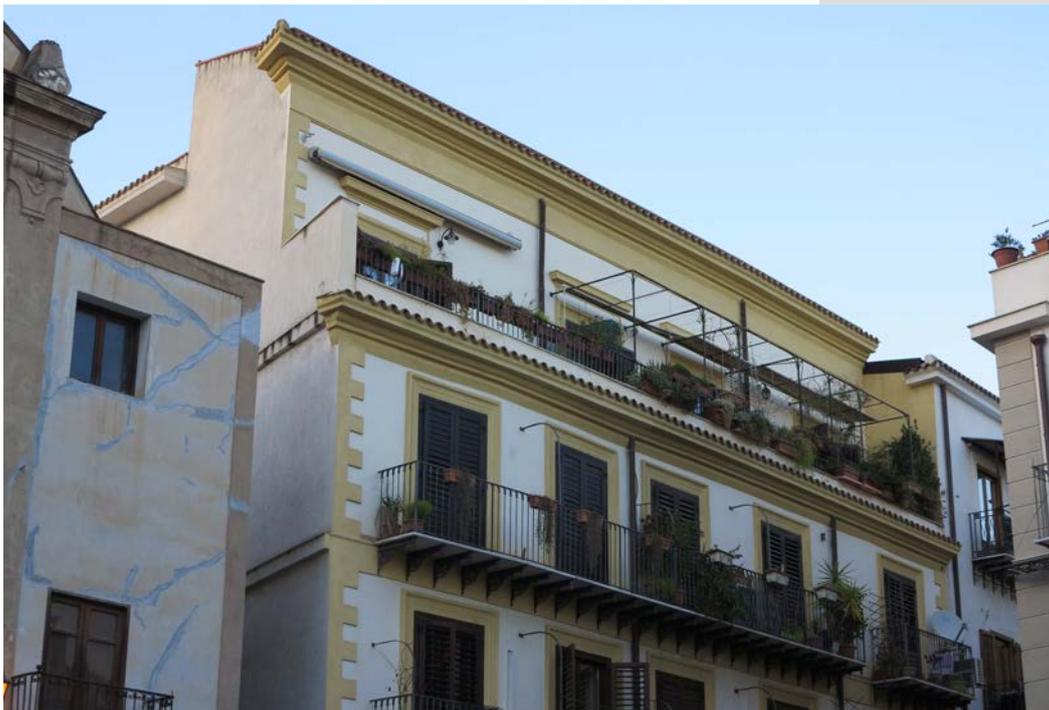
Building in piazza Beati Paoli. The additional storey was erected behind the building façade.
